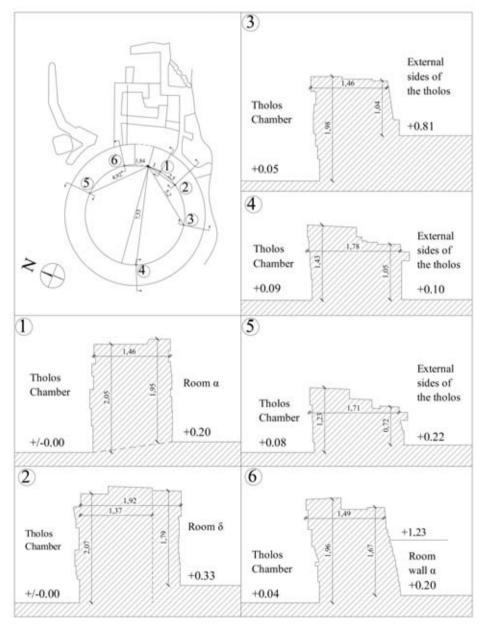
On site survey of the masonry cross section showing a pronounced slope inward of the tholos ring wall.
